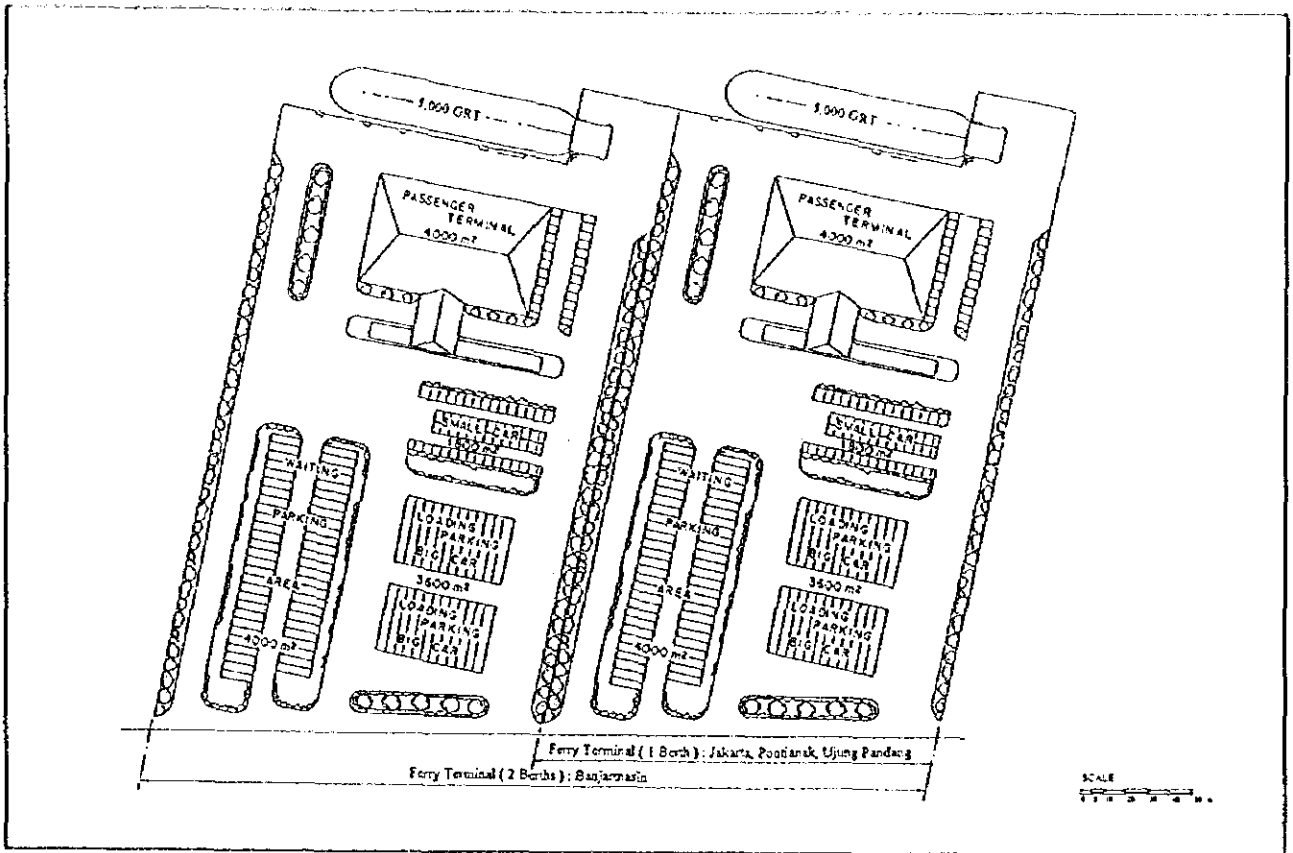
General Layout Plan of Ferry Terminal (5,000 GRT)
